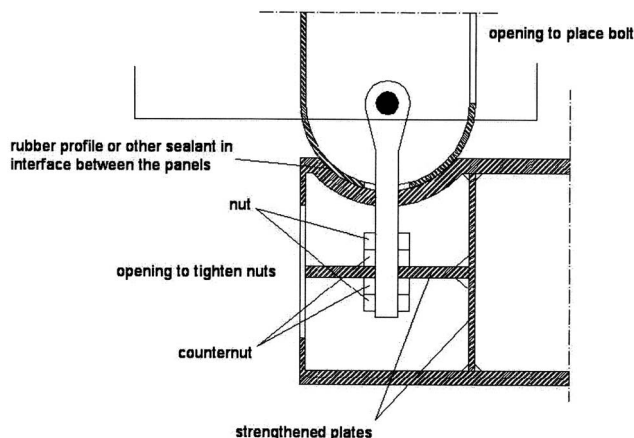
Alternative connection of arch segments to the floor (concept by Schanzlin)
